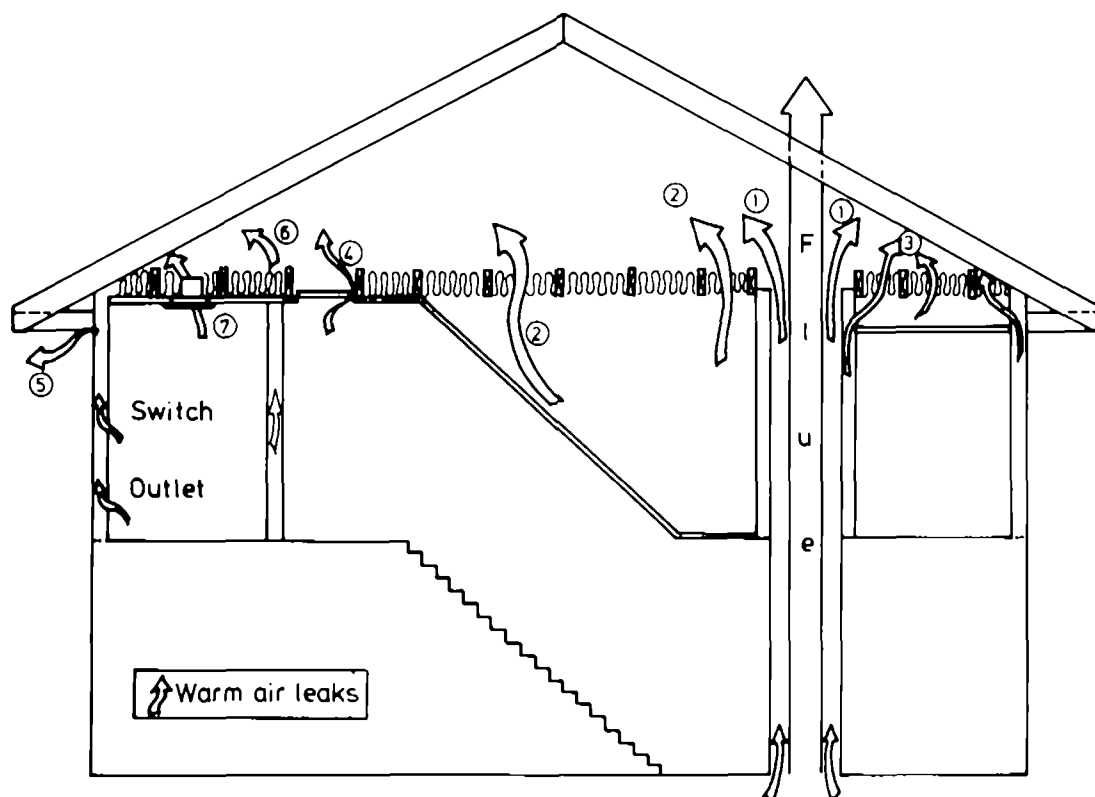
Common air exfiltration paths from the living space at the upper portions of the house: (1) around flue and plumbing stack, (2) through the insulation, (3) above soffit ceilings, (4) around entries, (5) penetrations in outer walls and eaves, (6) leakage up through interior walls and electrical systems and (7) recessed lights.
